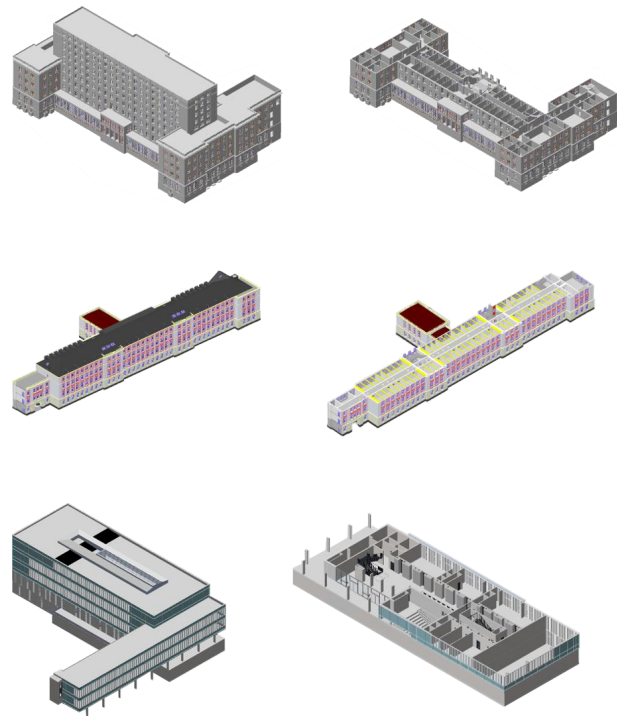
Campus buildings in IFC: Z-, S- and N-building (top to bottom) with external (left) and internal (right) isometric views
